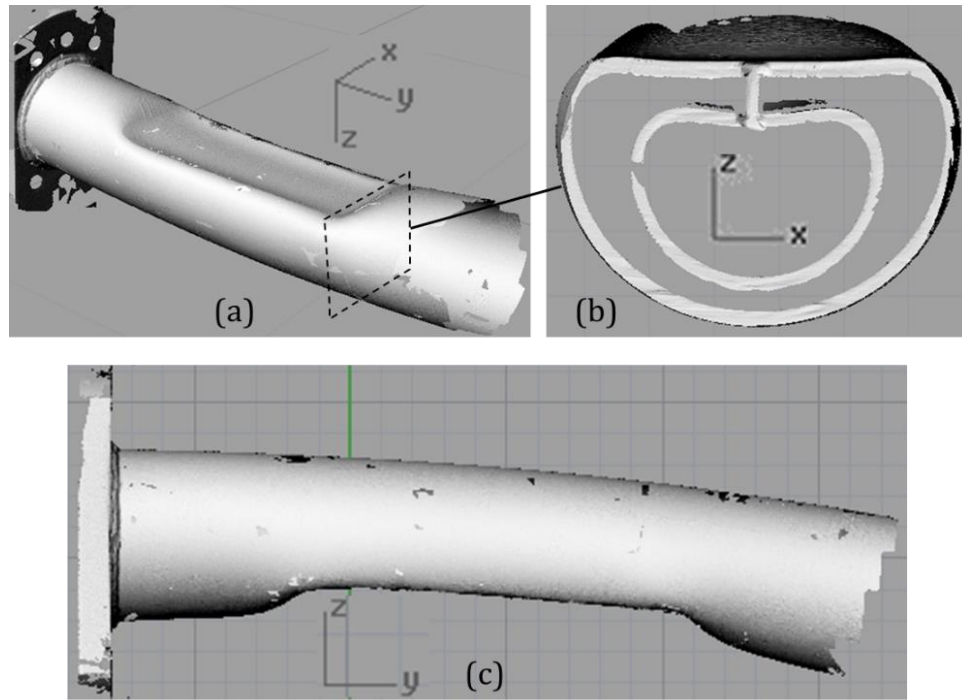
Scanned Views of the Deformed PiP Specimen Including the Isotropic View (a), View of the Cross-Section Where Phase 1 ends (b), and Elevation View (c)
